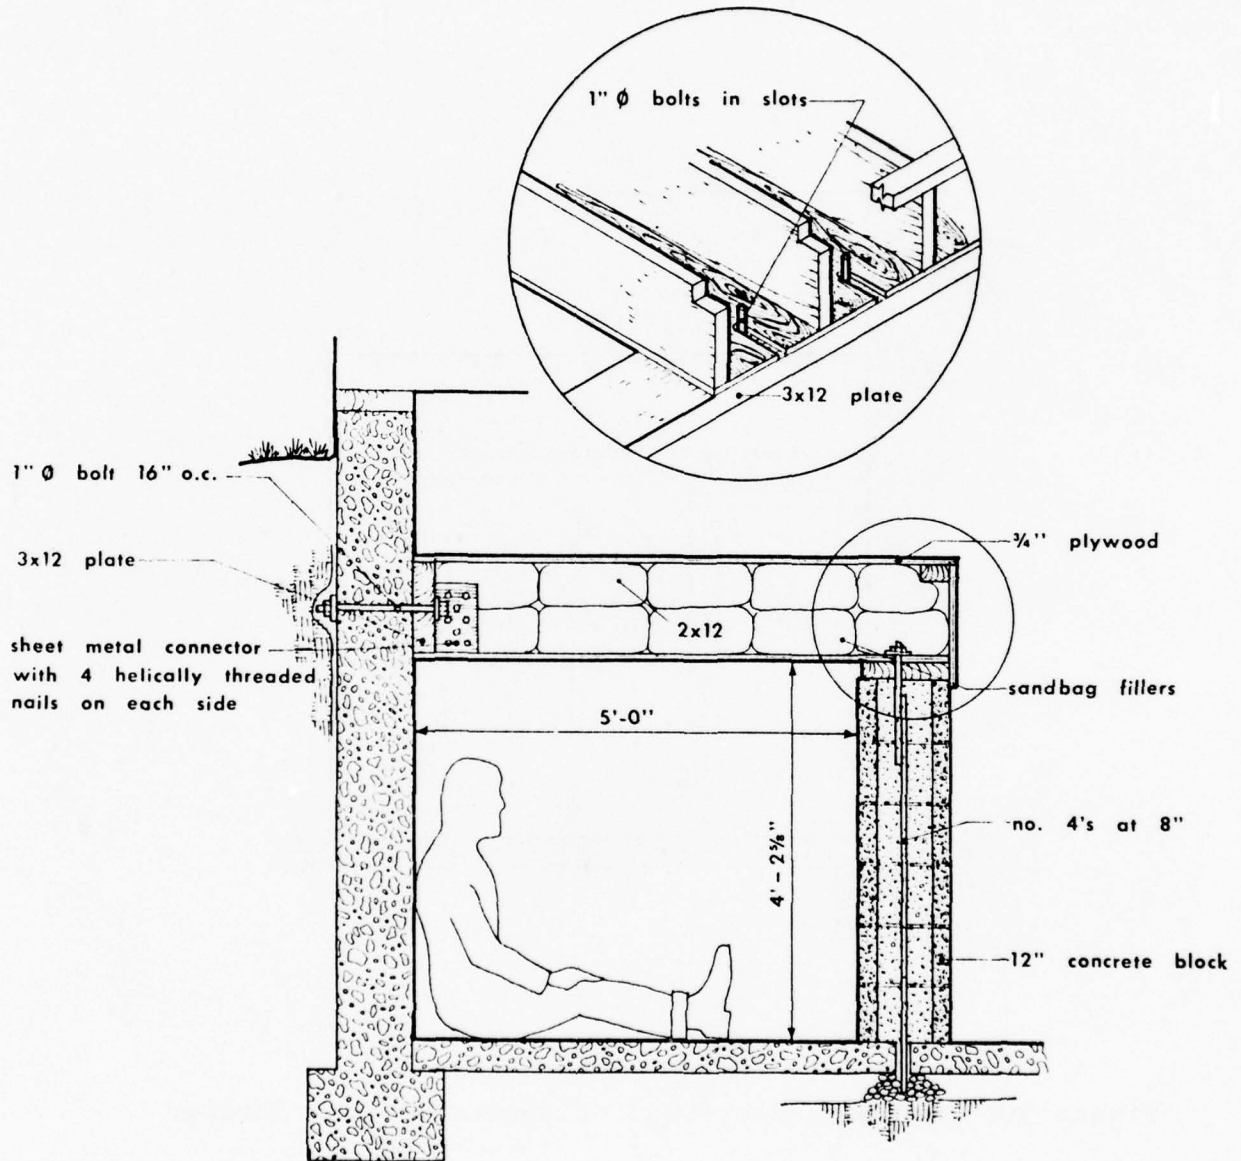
Shelter D, Reinforced Concrete Block Shelter
